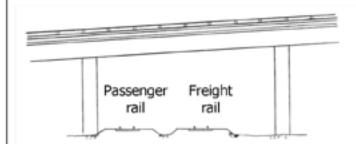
Bridge elevation view with one passenger rail and one freight rail track below the bridge.
